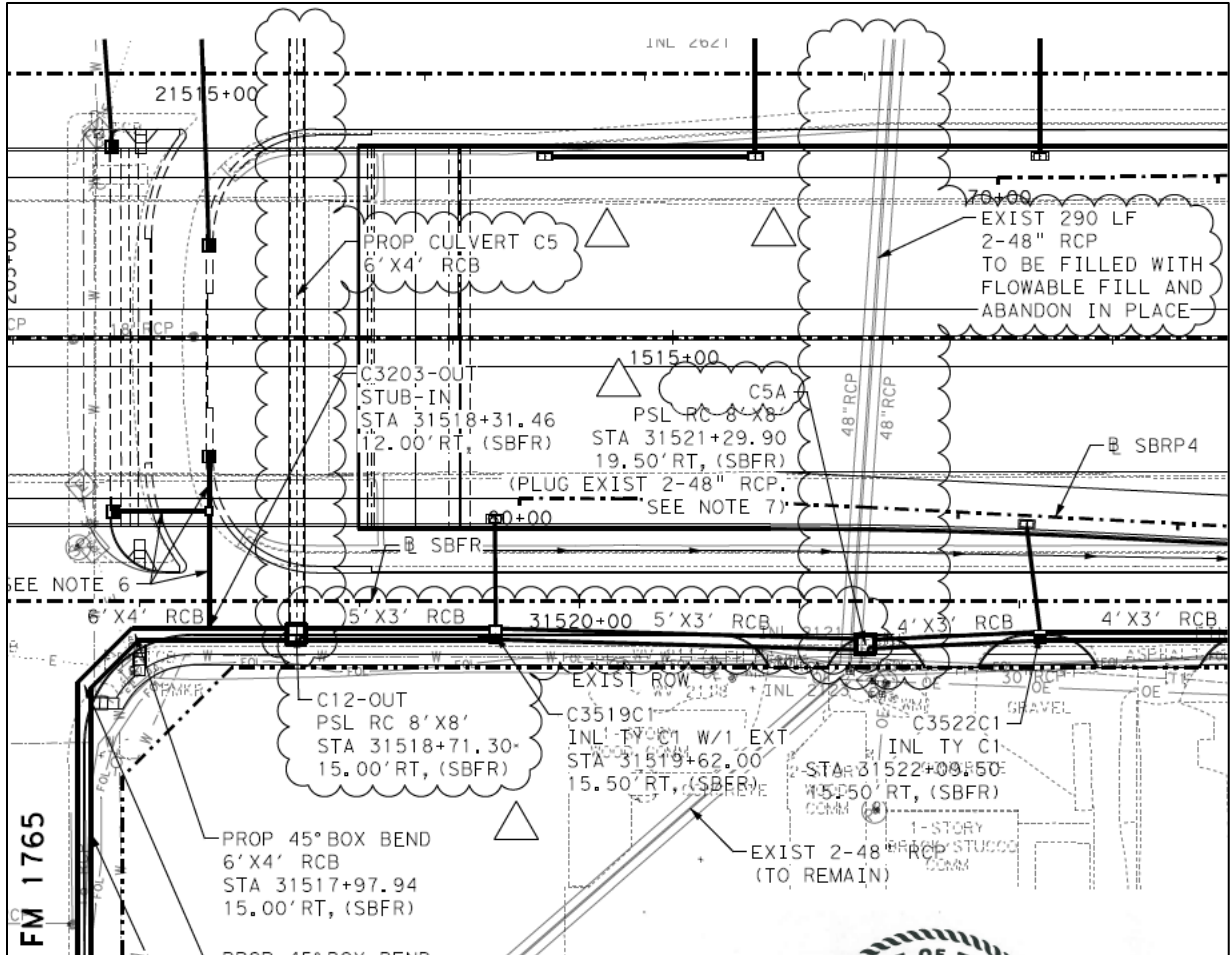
Existing and Revised Proposed Culvert Location⁸.
